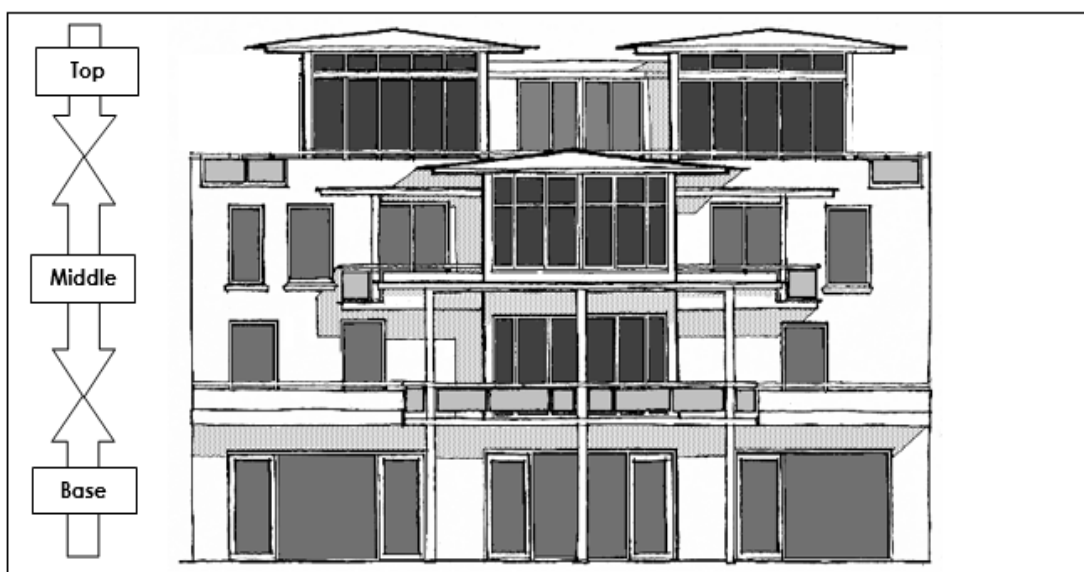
Street elevation illustrating appropriate form of three and four storey buildings. Penthouse level on five storey or greater buildings should be broken into pavilion structures separated by roofs or terraces
